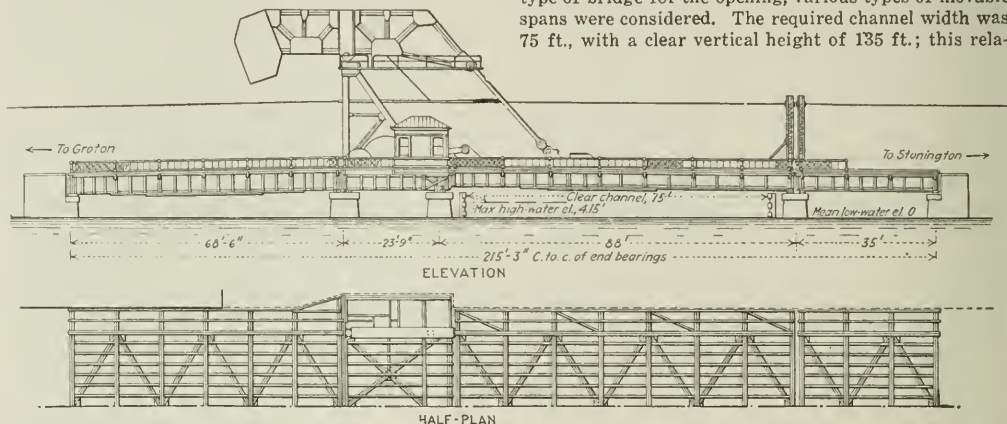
GENERAL PROFILE AND PLAN OF NEW BROWN BASCULE HIGHWAY BRIDGE AT MYSTIC, CONN.
